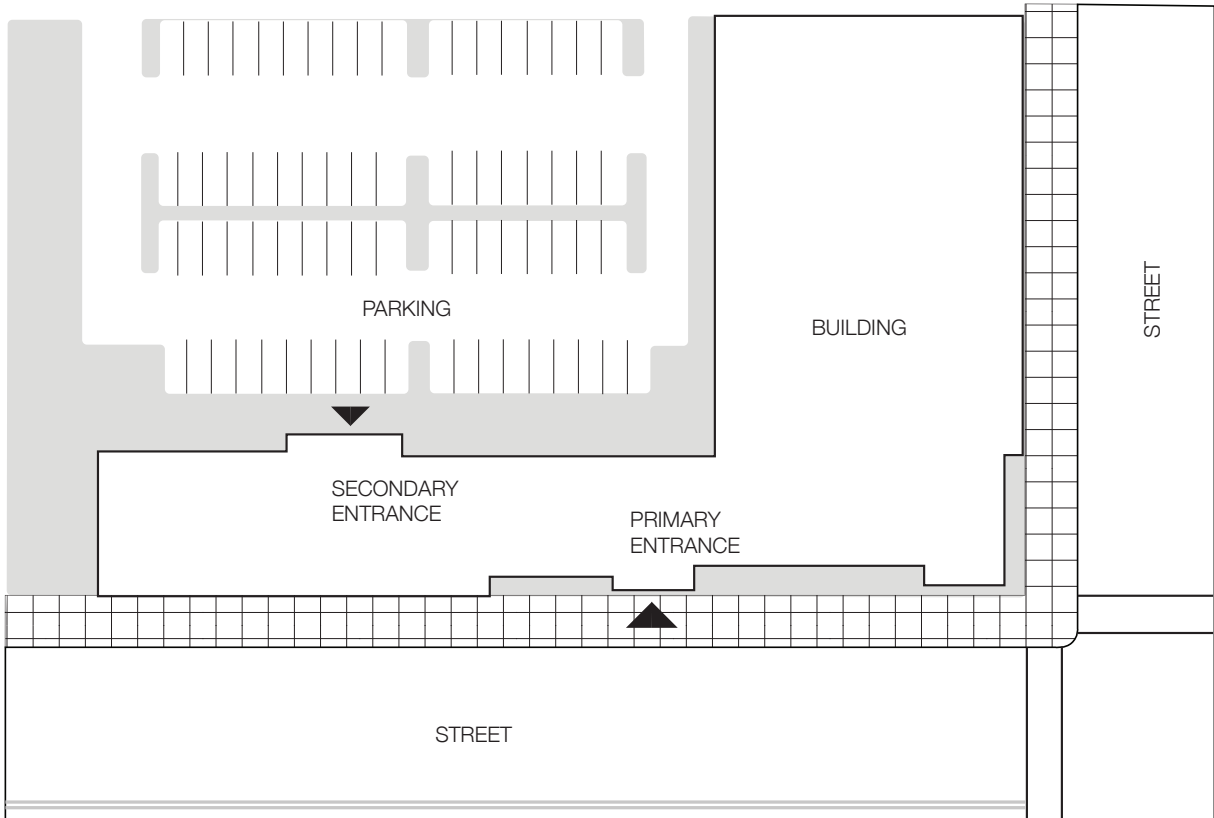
This image shows how parking is located in the inner part of the block to allow buildings to create a continuous sidewalk and street edge. Primary entrances are on the public sidewalk with alternative entrances adjacent to the parking.
